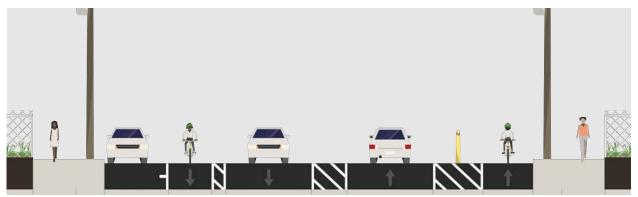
Proposed cross section of Evans Avenue between Cesar Chavez and Napoleon, looking northwest
